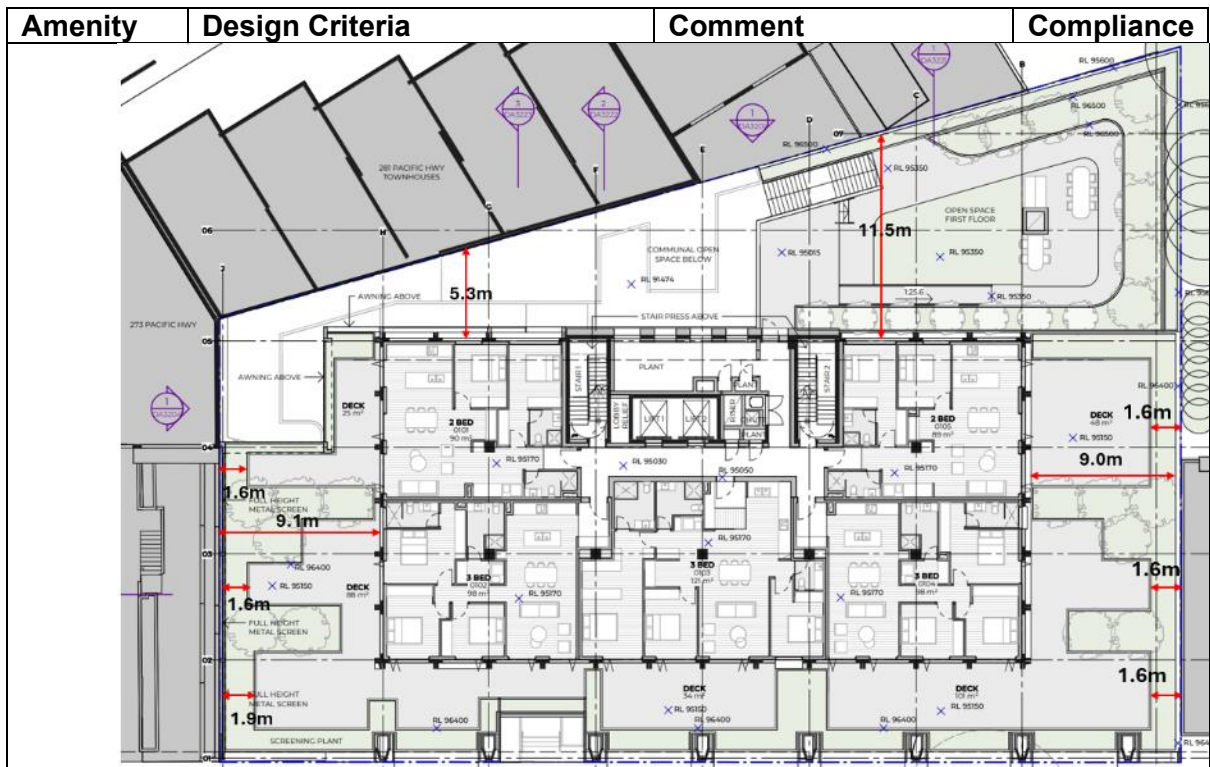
Annotated Proposed Level 01 Floor Plan, Dwg No. DA2204 Rev A
